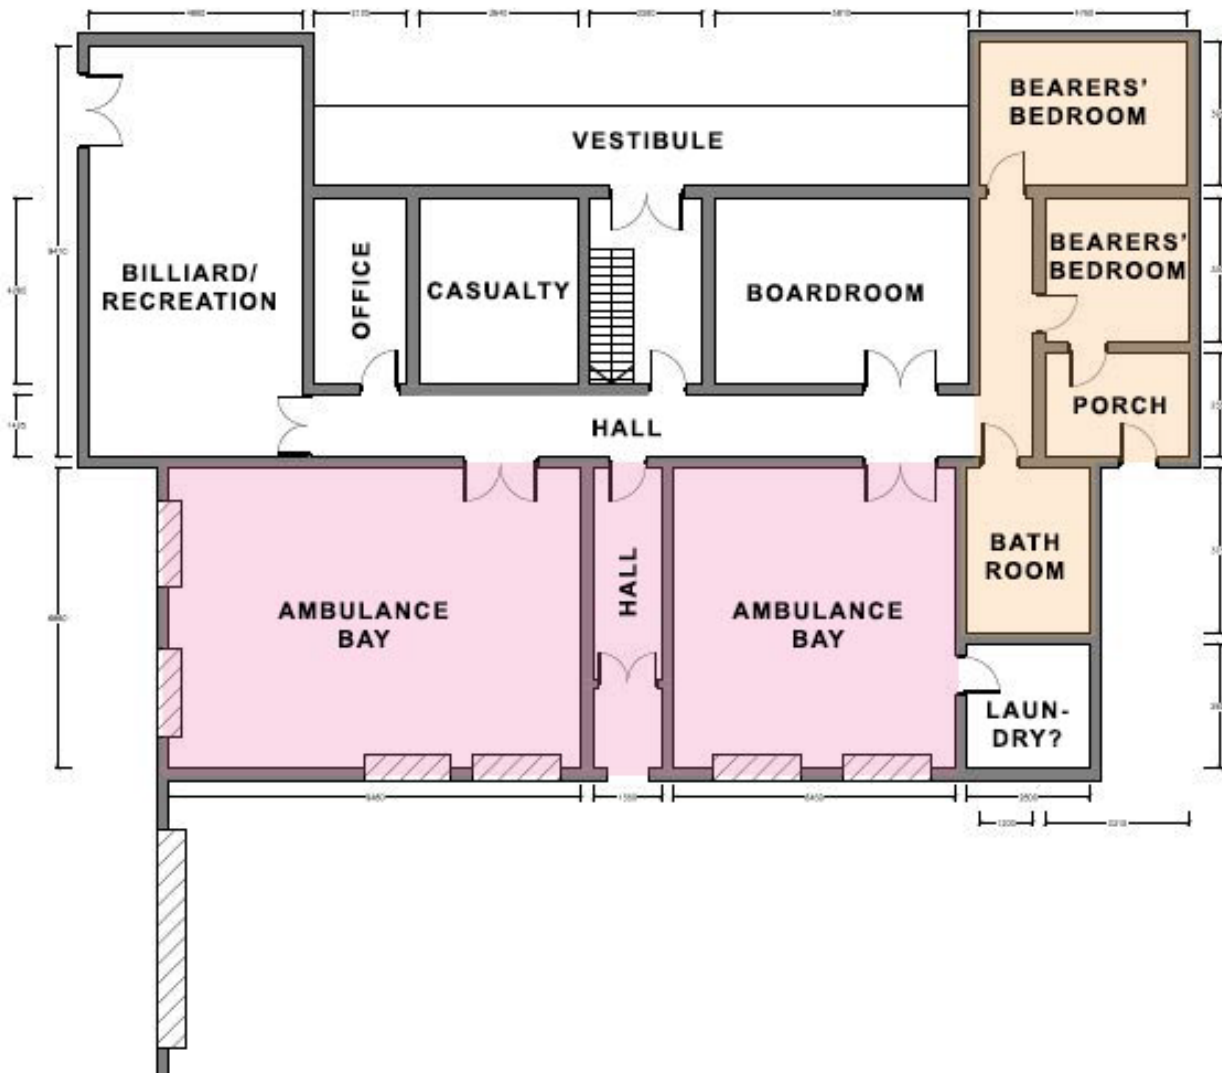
Conjectural original layout of the ground floor layout. Source: Base plan by Bathurst Regional Council.
